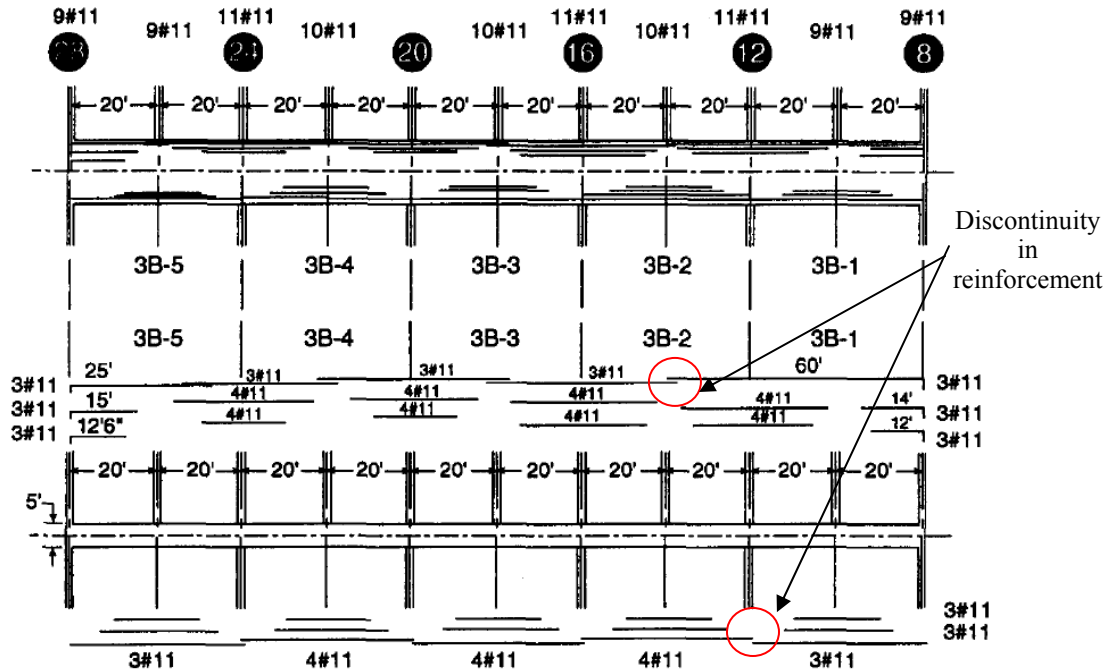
Reinforcement diagram for 3<sup>rd</sup> floor transfer girder [Sozen et al., 1998]
